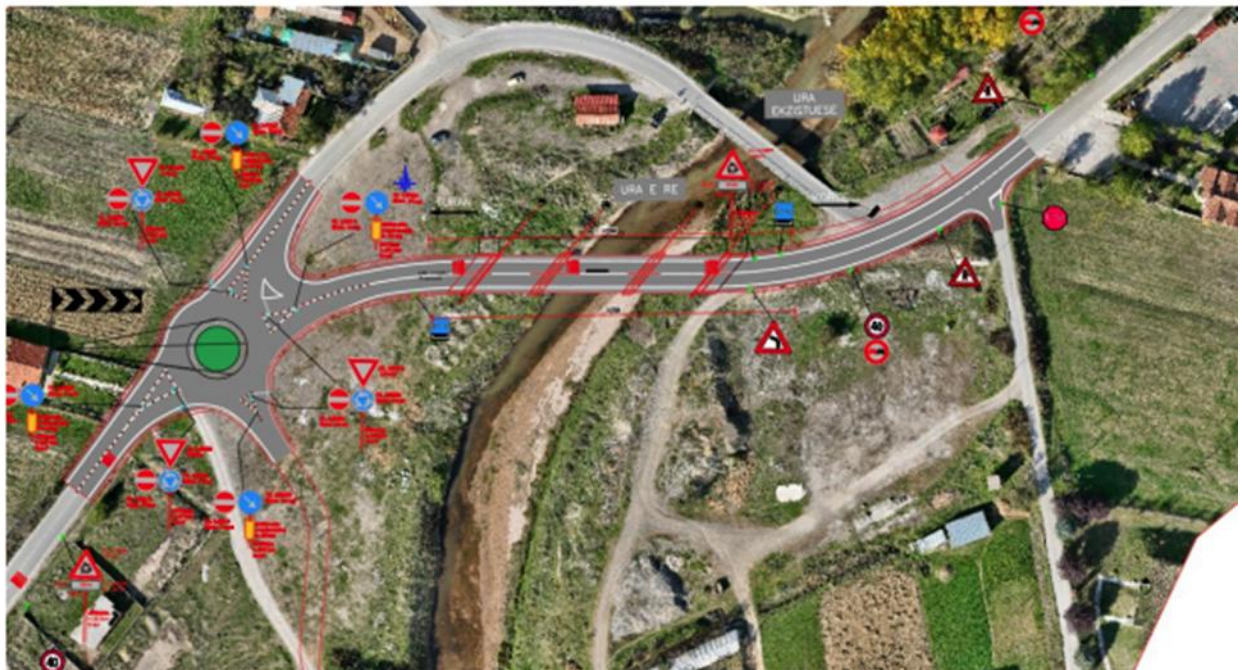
From the SH63 road (Desaretët), go through the roundabout to the new bridge.
